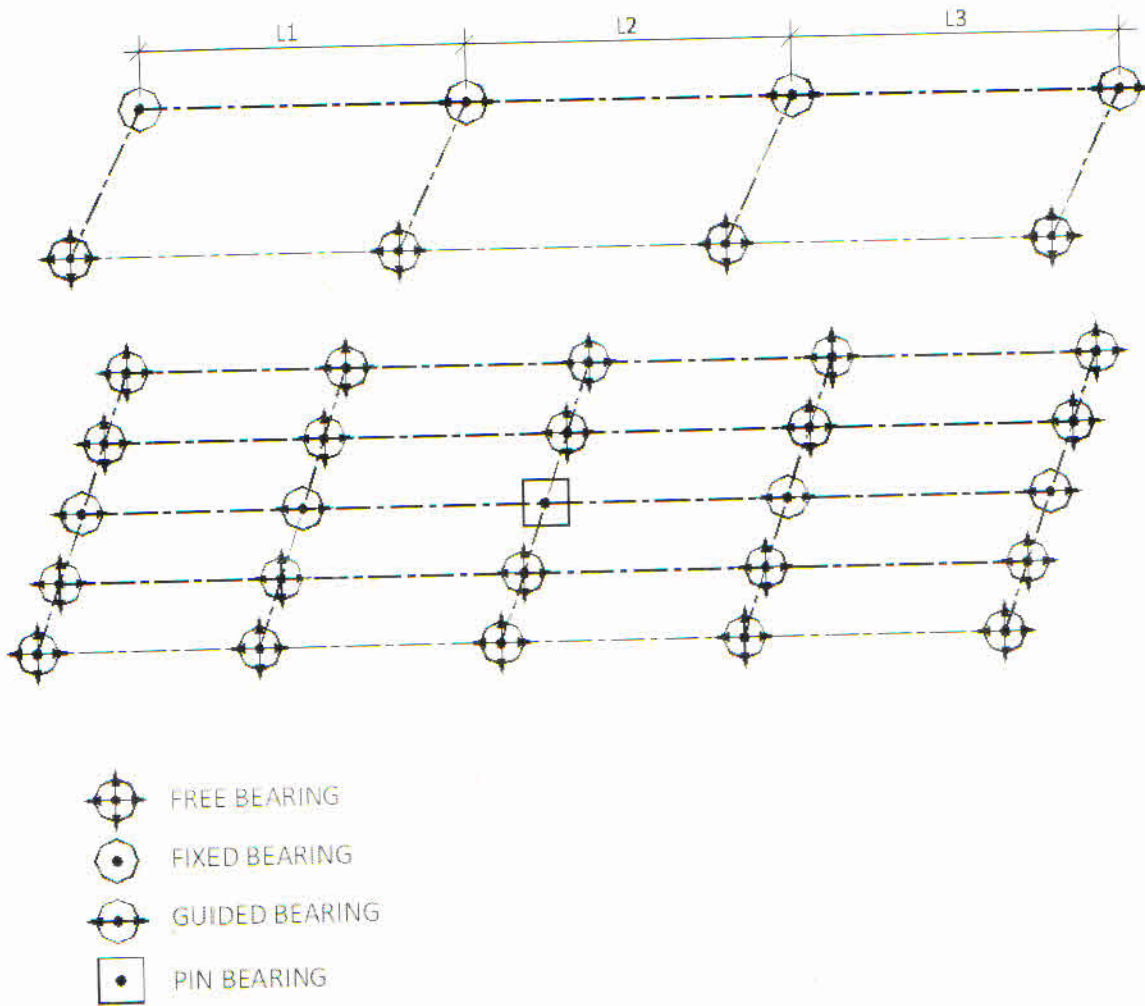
TYPICAL BEARING LAYOUTS FOR SKEWED CONTINUOUS BRIDGES
